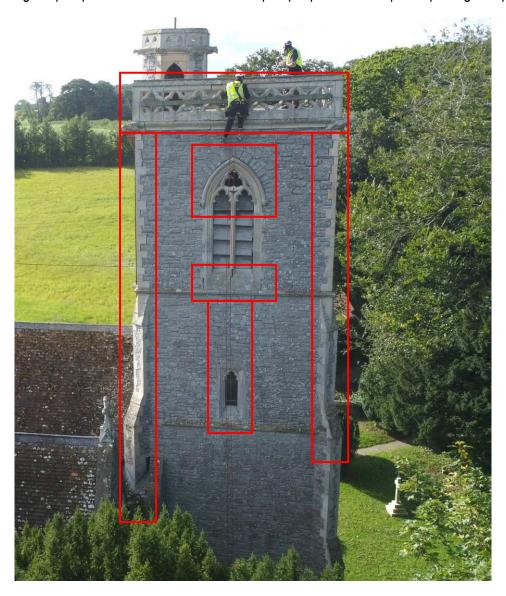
DJI_0191 Locations of Structural Issues in North Elevation
